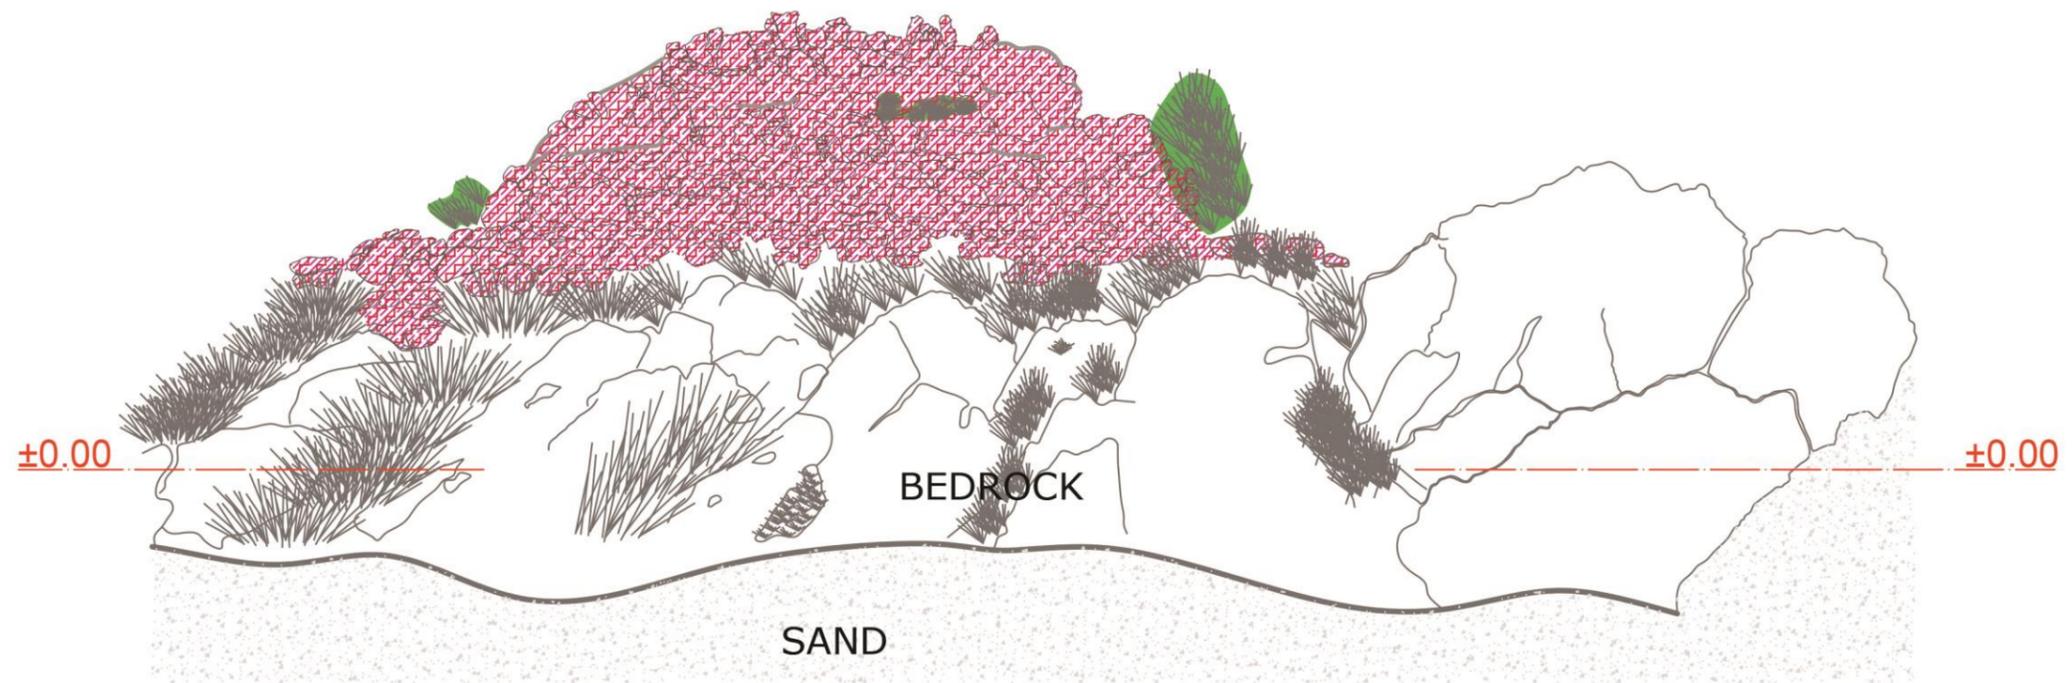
West Elevation - Structural Failures and Material Deterioration
